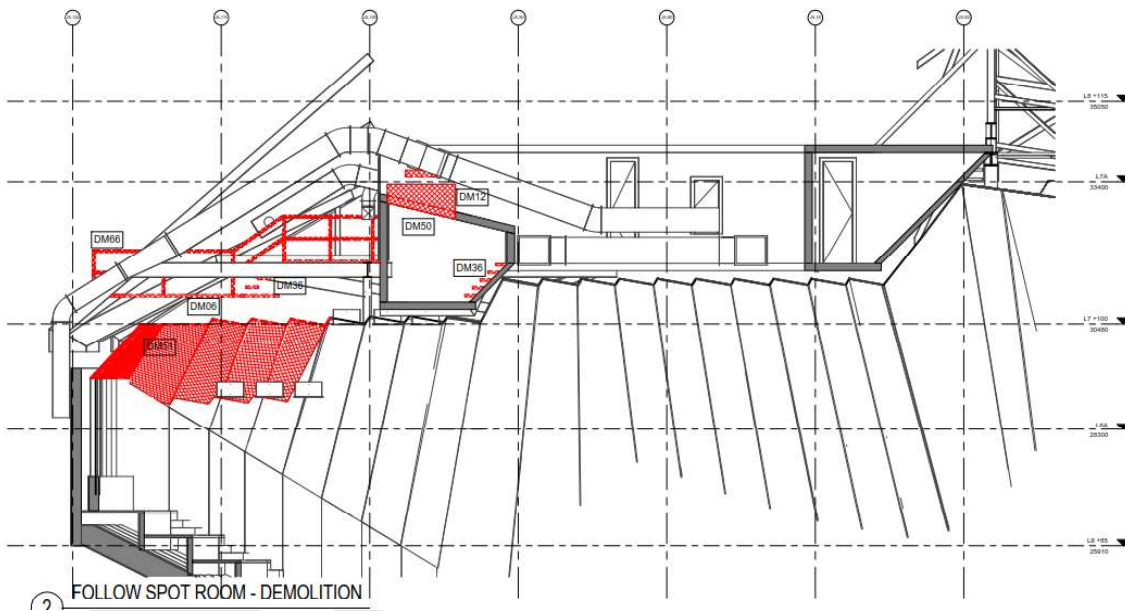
Demolition Plan Section of Existing Follow Spot Room
